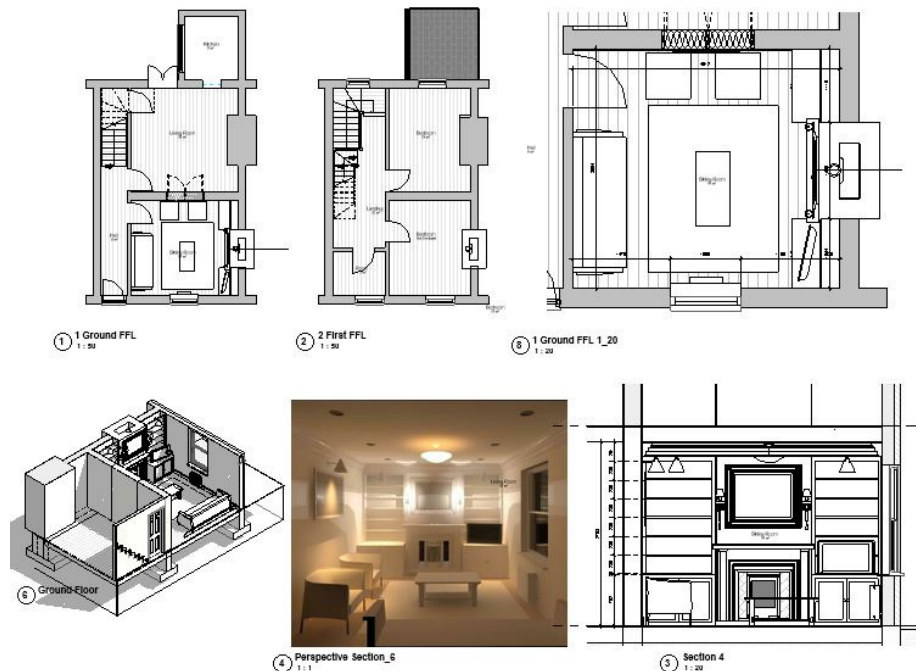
Authors own work; Plans, Sections, Elevations 3D View and Realistic Render views all from a single building model.
